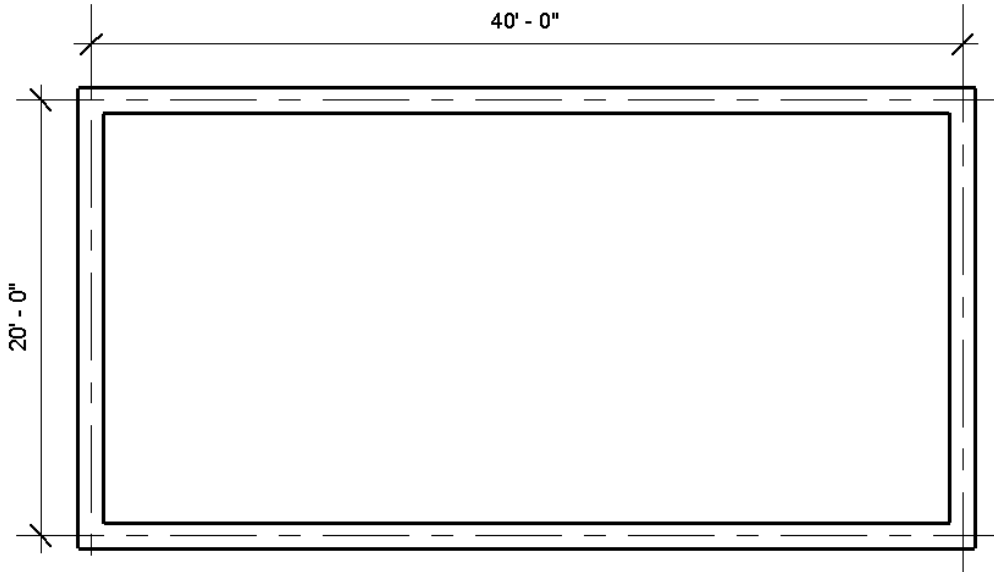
Sketch plan for creating exterior walls for the Apartment 1 project
